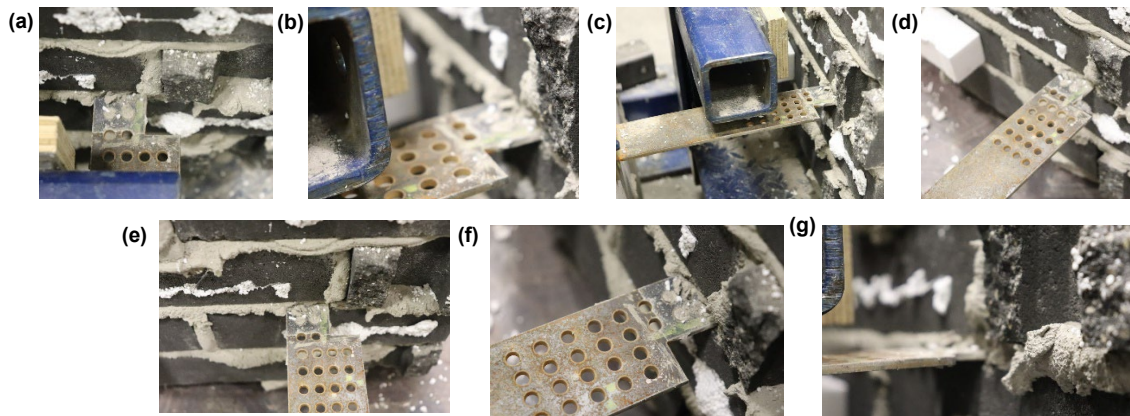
T-PH.CN-2 after testing of (a) top view, (b) elevated side view, (c) zoomed out elevated side view, (d) zoomed out alternative elevated side view, (e) top view, (f) alternative elevated side view, (g) side view
